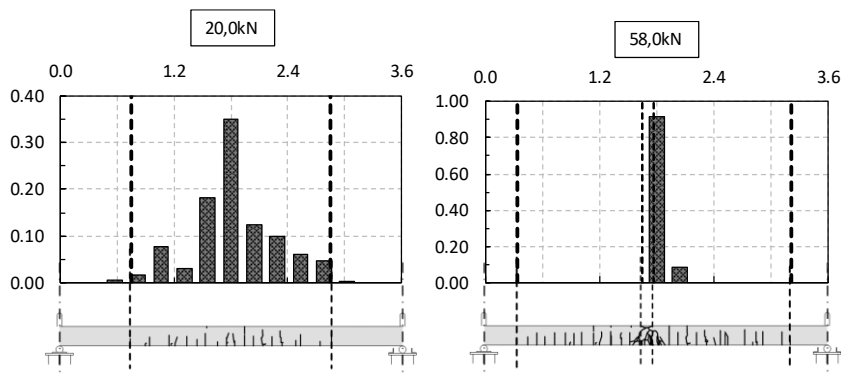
Detection of the cracked area (left) and localization of the concrete failure in the compression zone (right), both applying the DAD-method [13]
